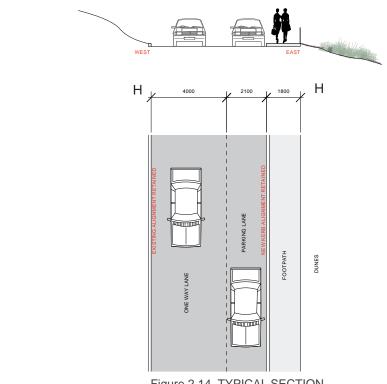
TYPICAL SECTION THROUGH HENDERSON PARADE SCALE 1:200
